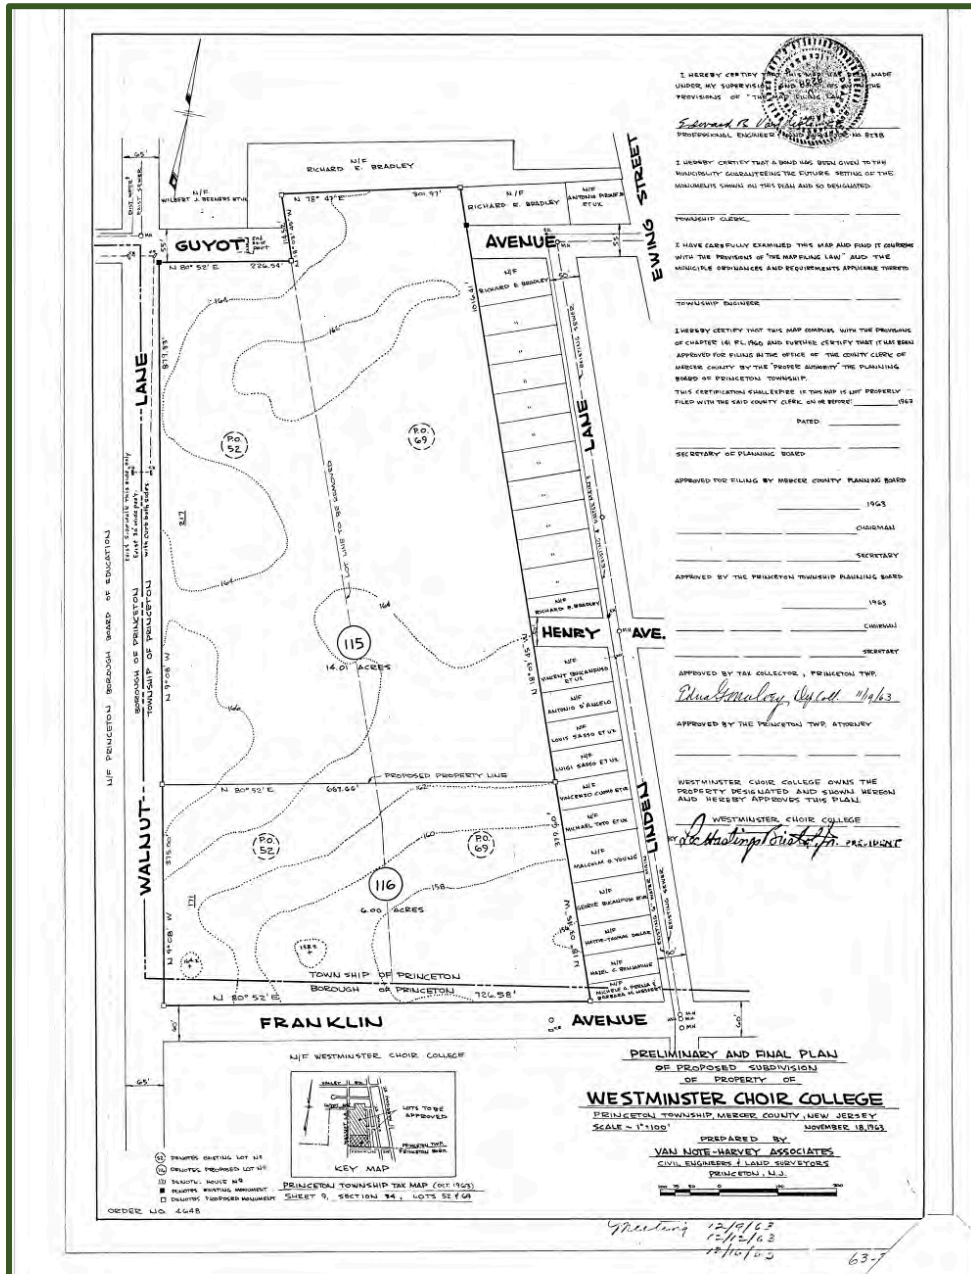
1964 Subdivision Plan showing orientation of Franklin Avenue prior to construction of Princeton Middle School.
